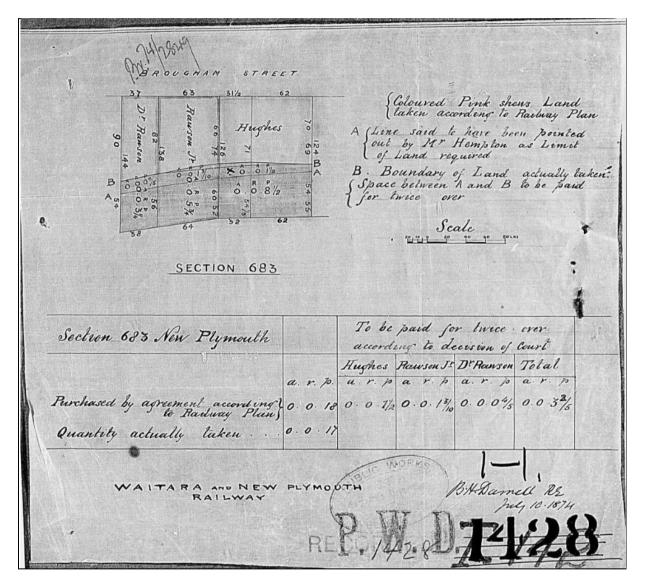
Public Works Department Plan showing parts of Town Section 683 taken for Waitara and New Plymouth Railway (Plan by B. H. Darnell. "Waitara and New
